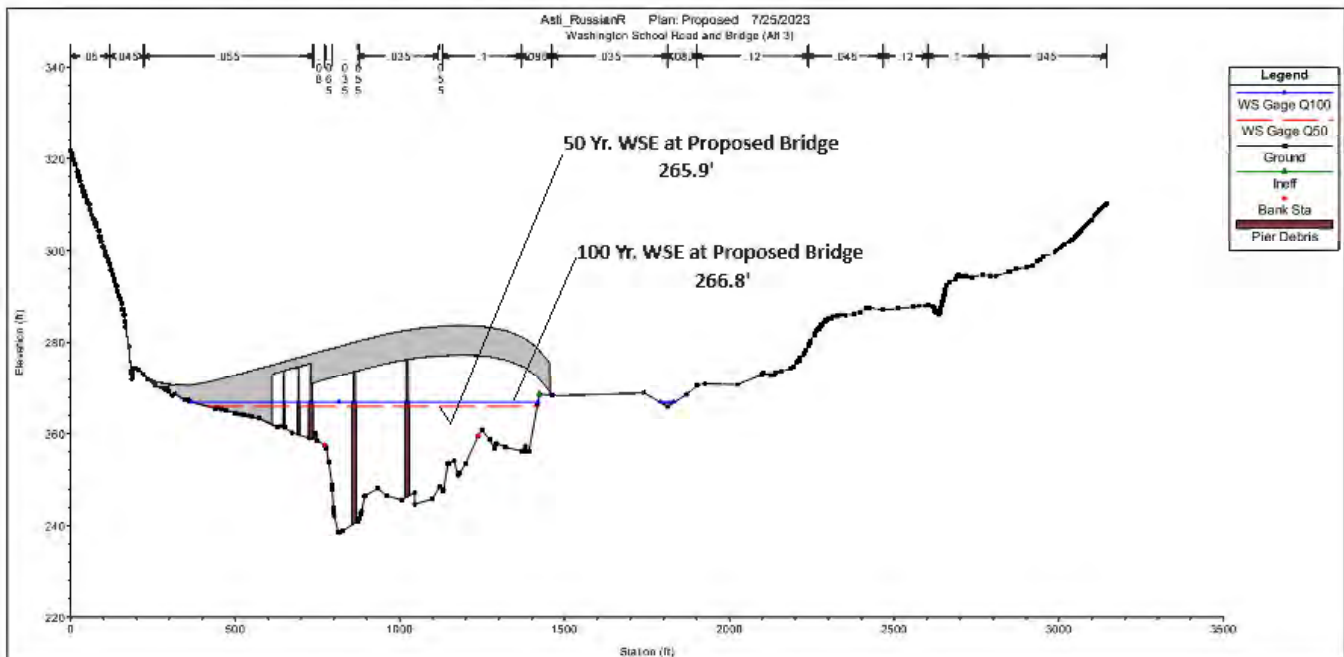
50 Yr. and 100 Yr. WSE at Proposed Bridge
